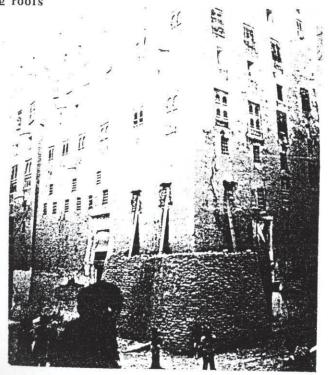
Shibam, Yemen, A tall mudbrick house which has begun to collapse as a result of gorund water affecting the foundations, showing the method of temporary buttressing using wooden props and additional bricks.
